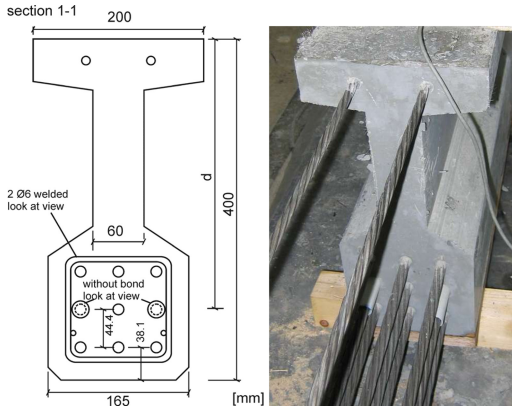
Cross section of T1–T4 (T4 without debonded strands).
